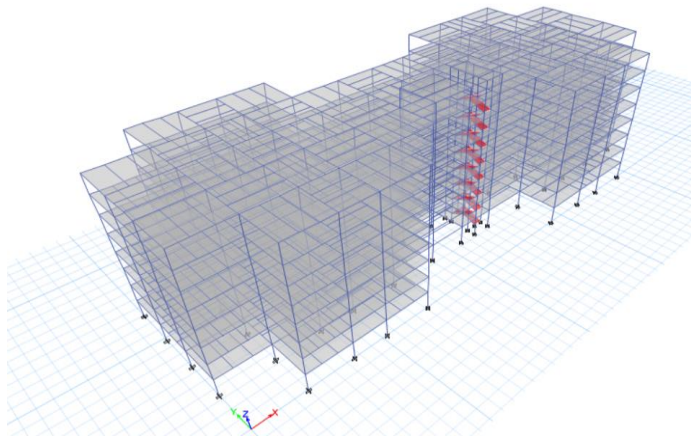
3D VIEW OF UNBRACED BUILDING
